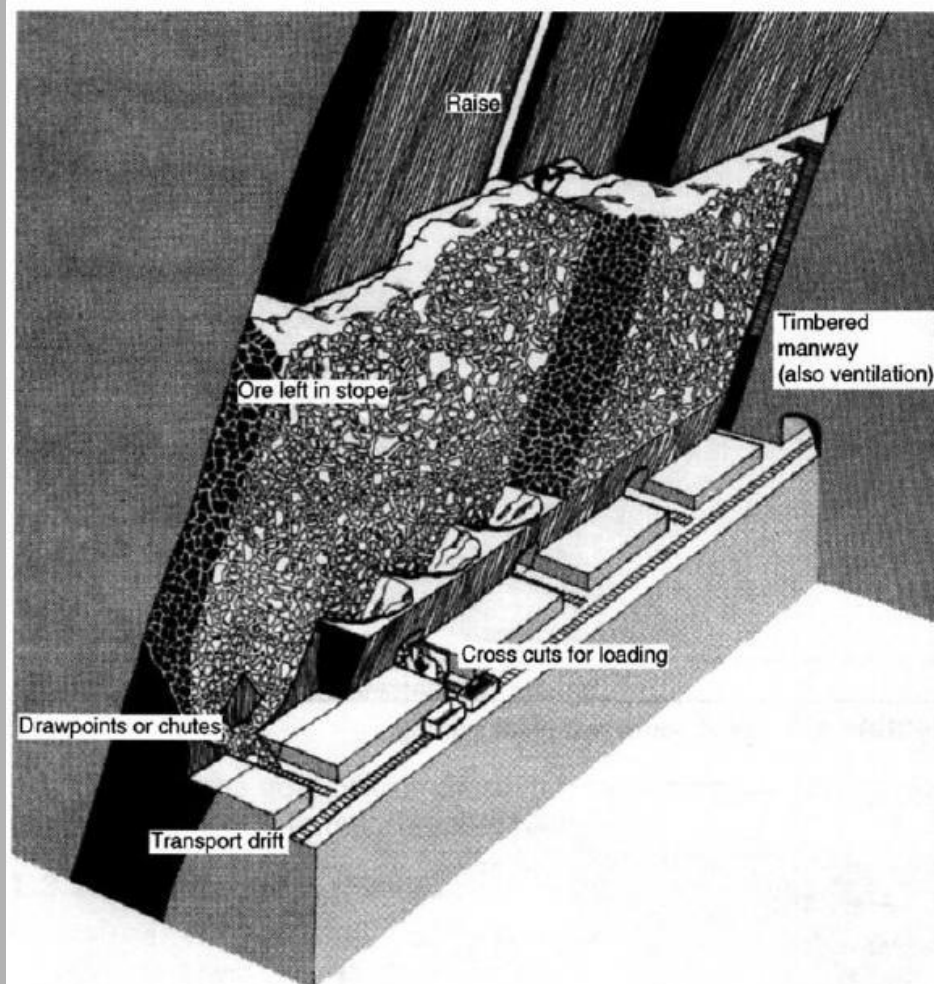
Shrinkage stoping with cross-cut loading
